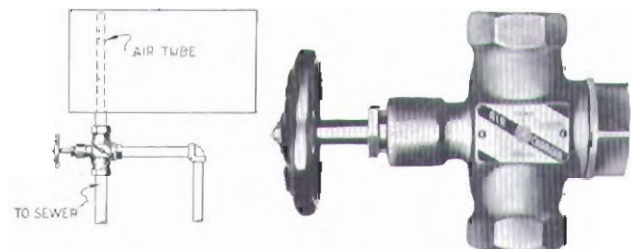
Method of installing a B & G Air Charger and Tank Drainer.
